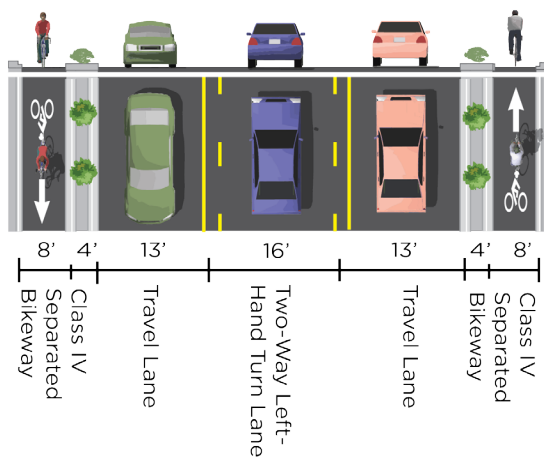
shows an example of a typical road rebalancing cross section that could be applied to San Bernardino Avenue.
